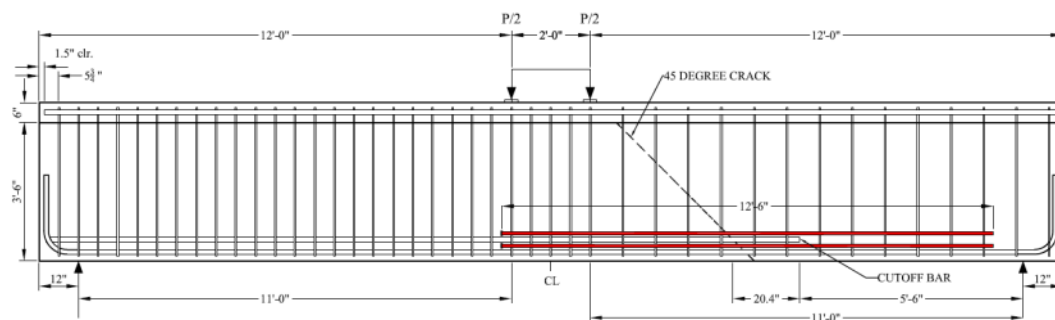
Elevation of specimen T.45.Ld3(10).Ti
